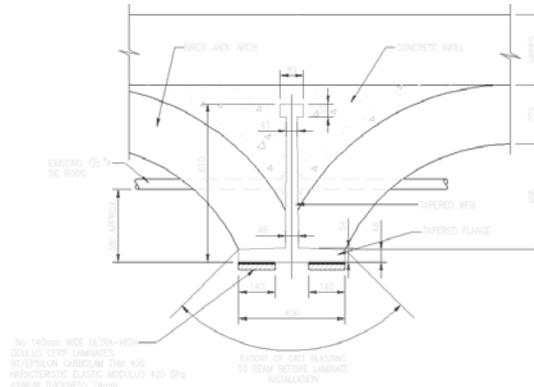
Section through cast iron beam of the north span showing the externally applied reinforcement
